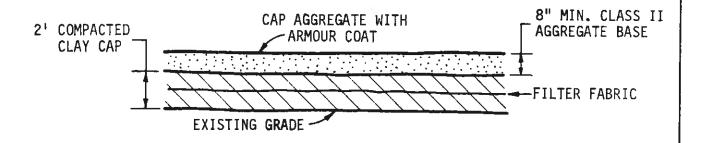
TYPICAL FOUNDATION DETAILS FOR BOAT REPAIR BUILDING MARINA POINT OYSTER
